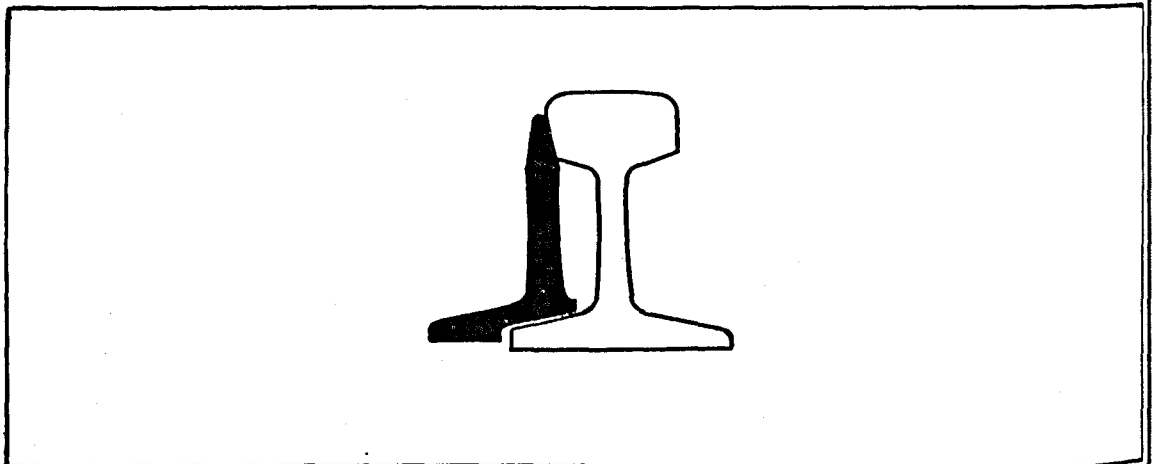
POINT BASE & SWITCH TOE SECTIONS
